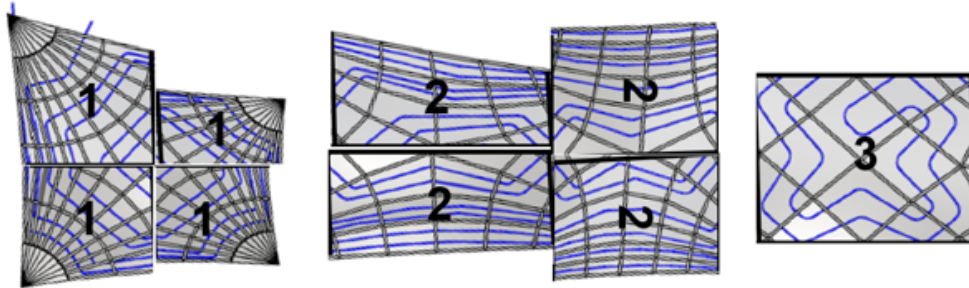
Top view of floor TABS cut and regrouped into subsections with similar geometrical properties.
